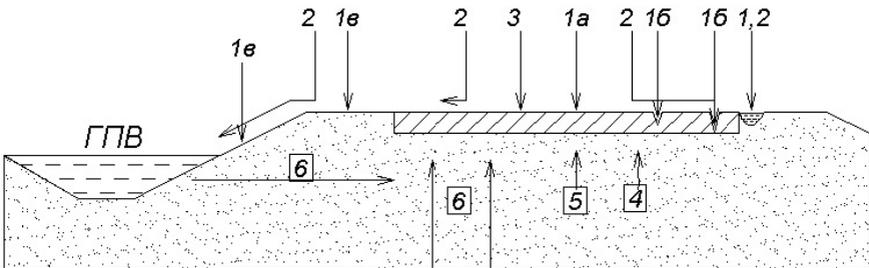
Sources of humidification of pavement and subgrade according to V.M. Sidenko: External: 1 – moisturizing precipitation; 1a – pavement cover; 1b – layers of pavement and a soil base through cracks; 1c – ground of roadsides and slopes; 2 - surface runoff; 3 – atmospheric water vapor; Internal: 4 – water vapor of pore air; 5 – film water; 6 – free water
